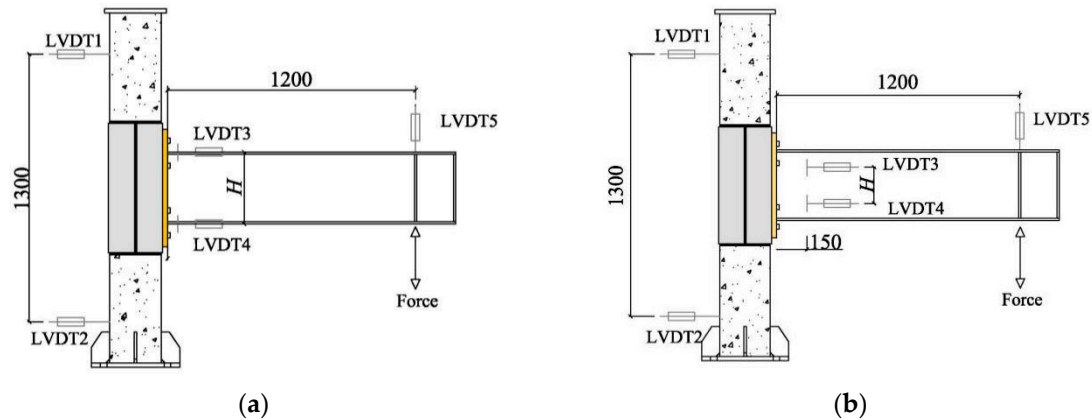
Arrangement of LVDTs for specimens (units: mm). (a) SJ-1 through SJ-5; (b) SJ-6 through SJ-8.
